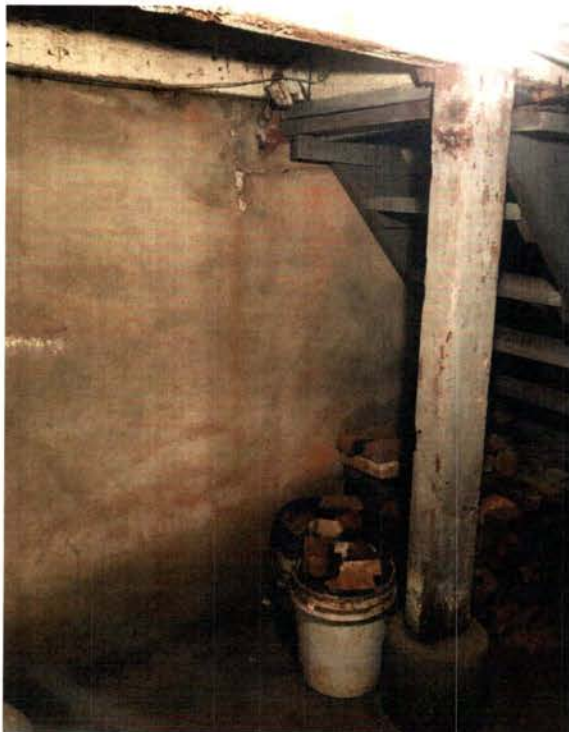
Cellar (Room 007) looking SW. Rising damp at this wall, the wall between Builds B and C, has caused damage above the 1st floor level. Due to deterioration caused by persistent water, the post base at the stairs leading up to the kitchen has been cut and replaced by a concrete base.
